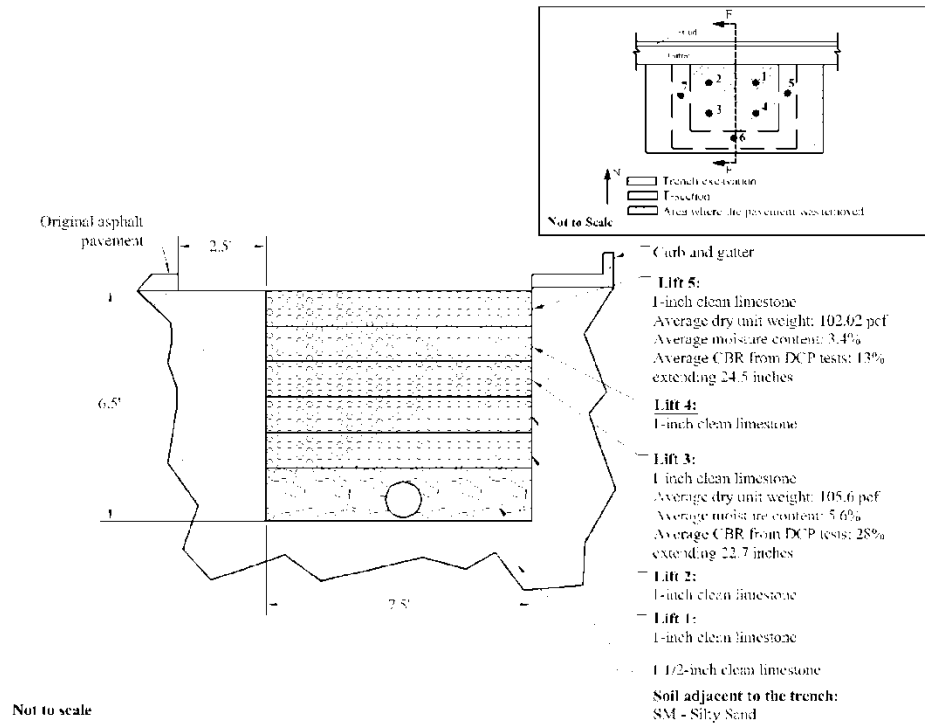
Cross-section of Trench E on July 17, 2008; (a) plan view, (b) cross-section
